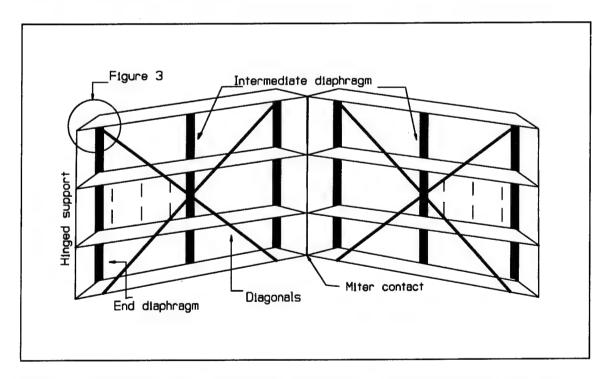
Downstream view of detailed structural elements of horizontally framed miter gate
